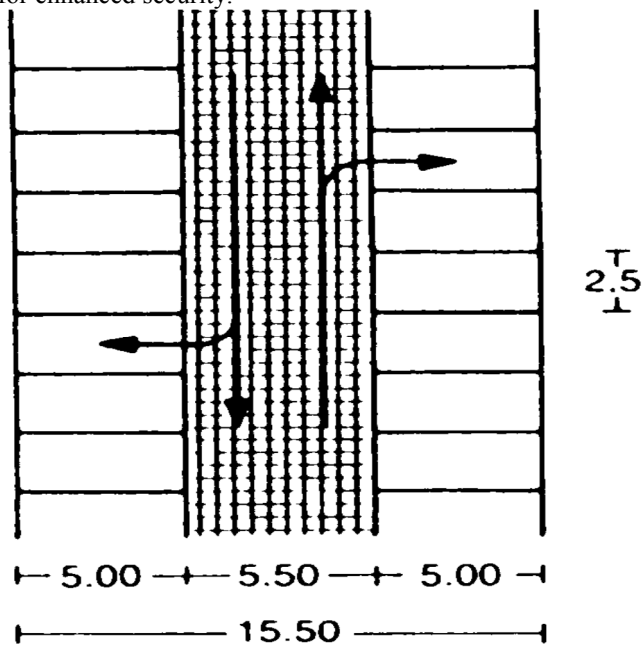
90° Exit/Entry, Two – Way Traffic Parking Space 2.5 m Wide - The Adopted Format.
